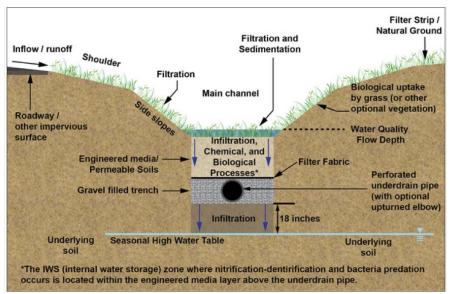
Typical bioswale cross section and stormwater treatment process (Ekka & Hunt, 2020)
